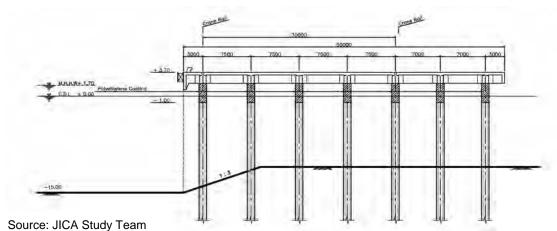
Typical Cross Section of the Wharf at Socah
